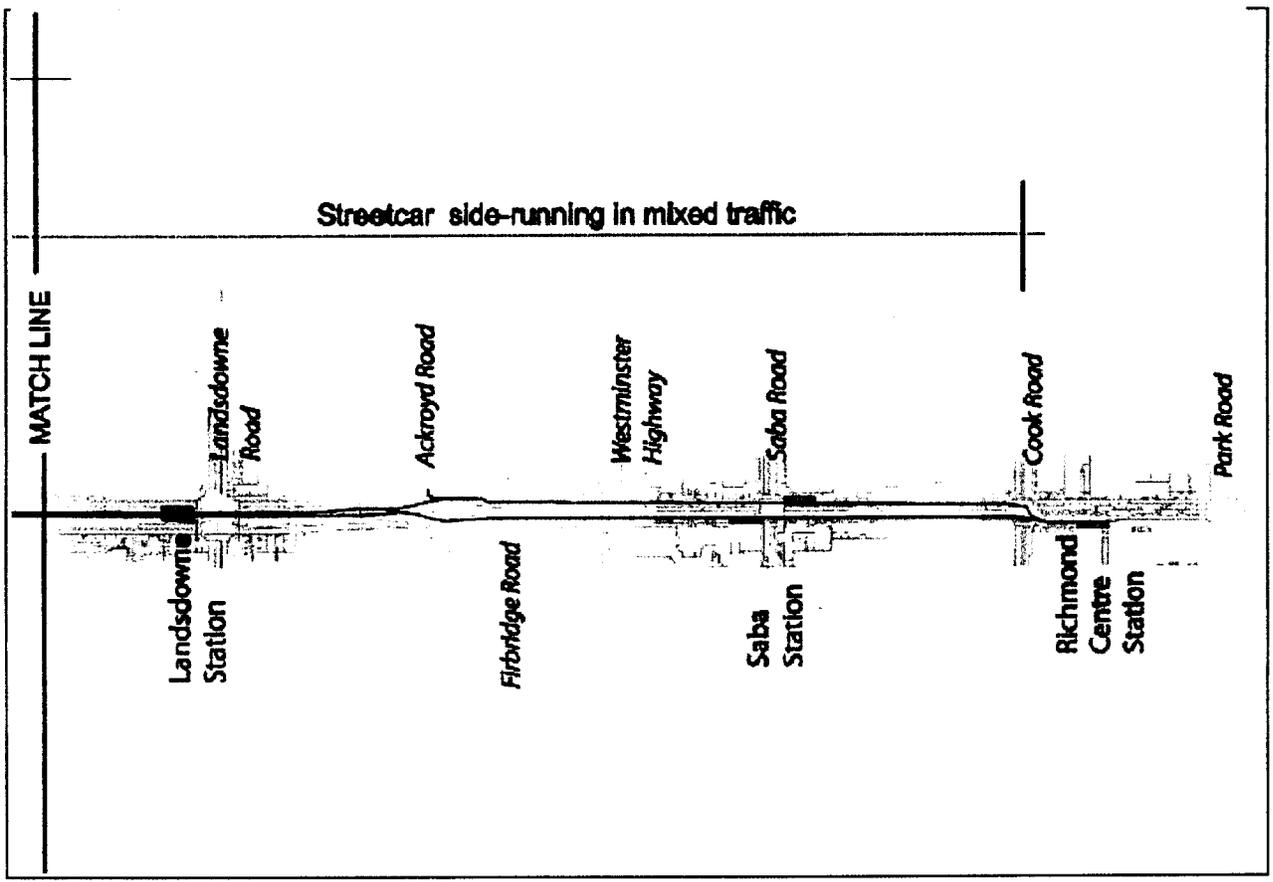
Streetcar Alignment on No. 3 Road (Part 3 of 3)
